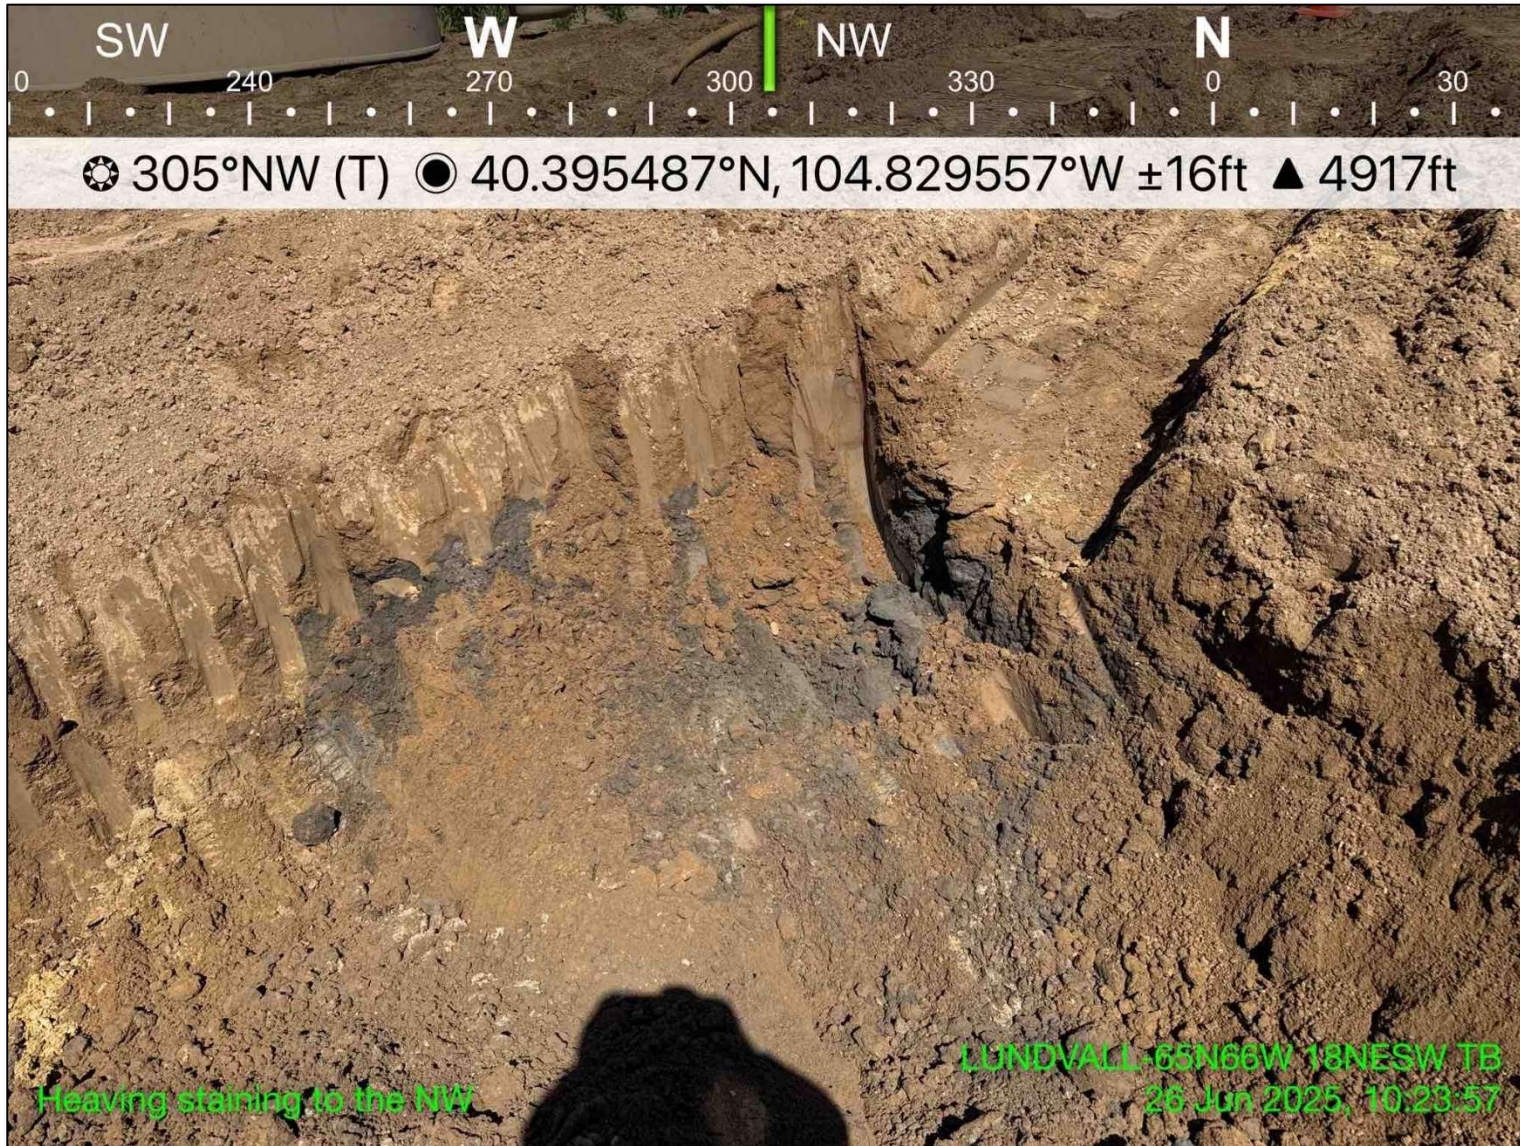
View of northwest corner of PWV01 excavation, facing northwest
